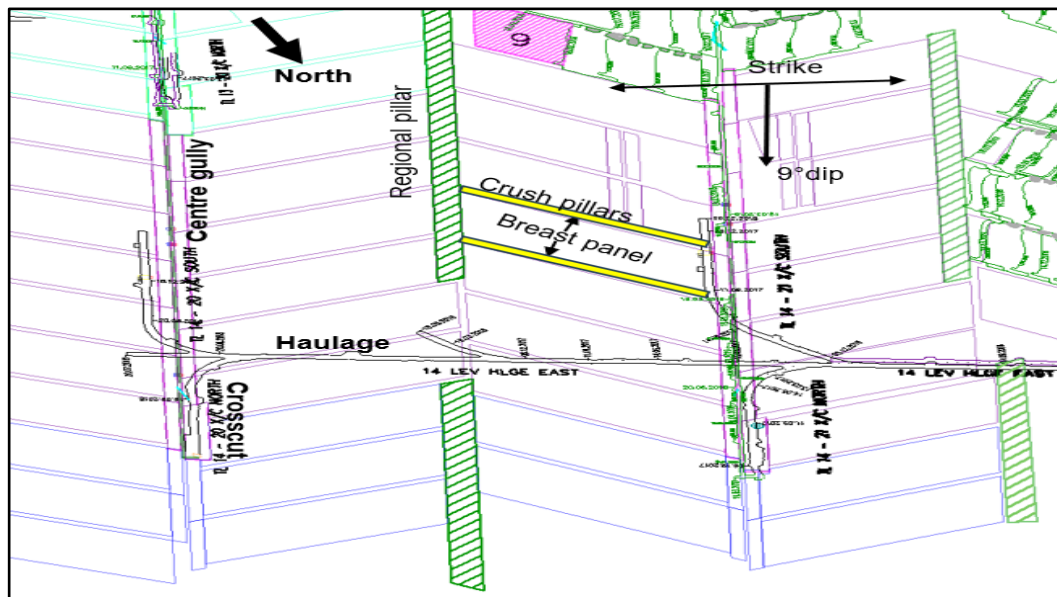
Typical plan view of the accesses and stoping excavations for Thembelani Mine
